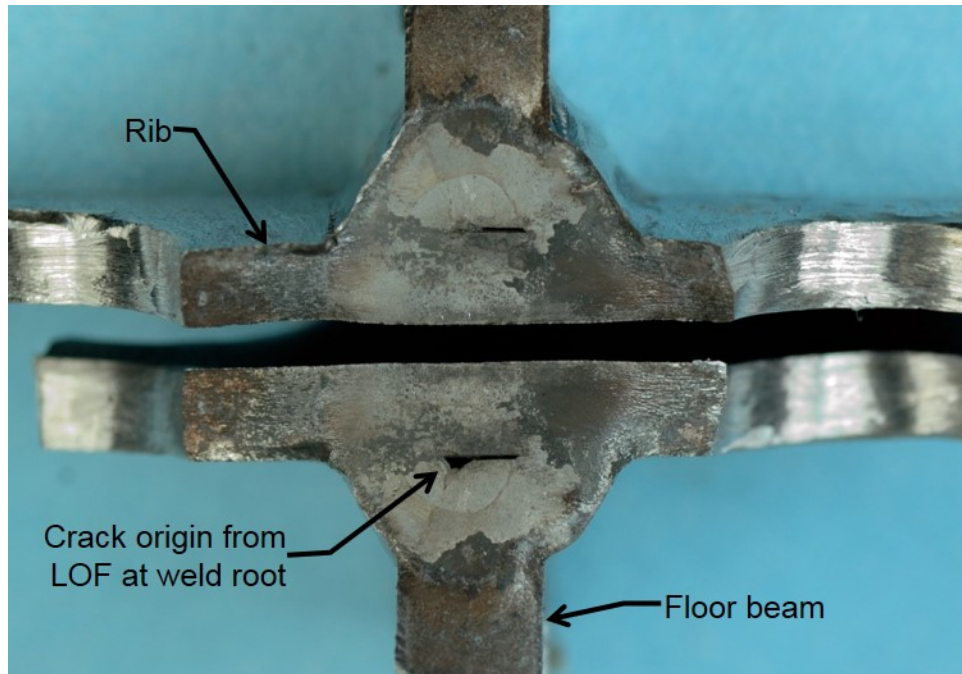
Mating fatigue fracture surfaces for the crack to the south of rib at 55 degrees from rib soffit in MU3
